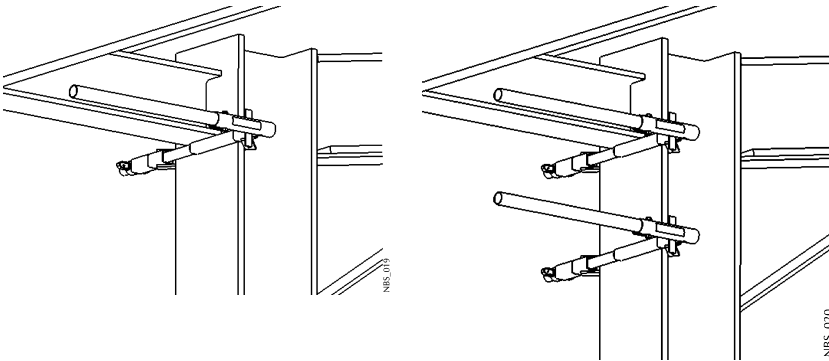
Mounting of Steel Jaw Clamp and Adapter Tube
